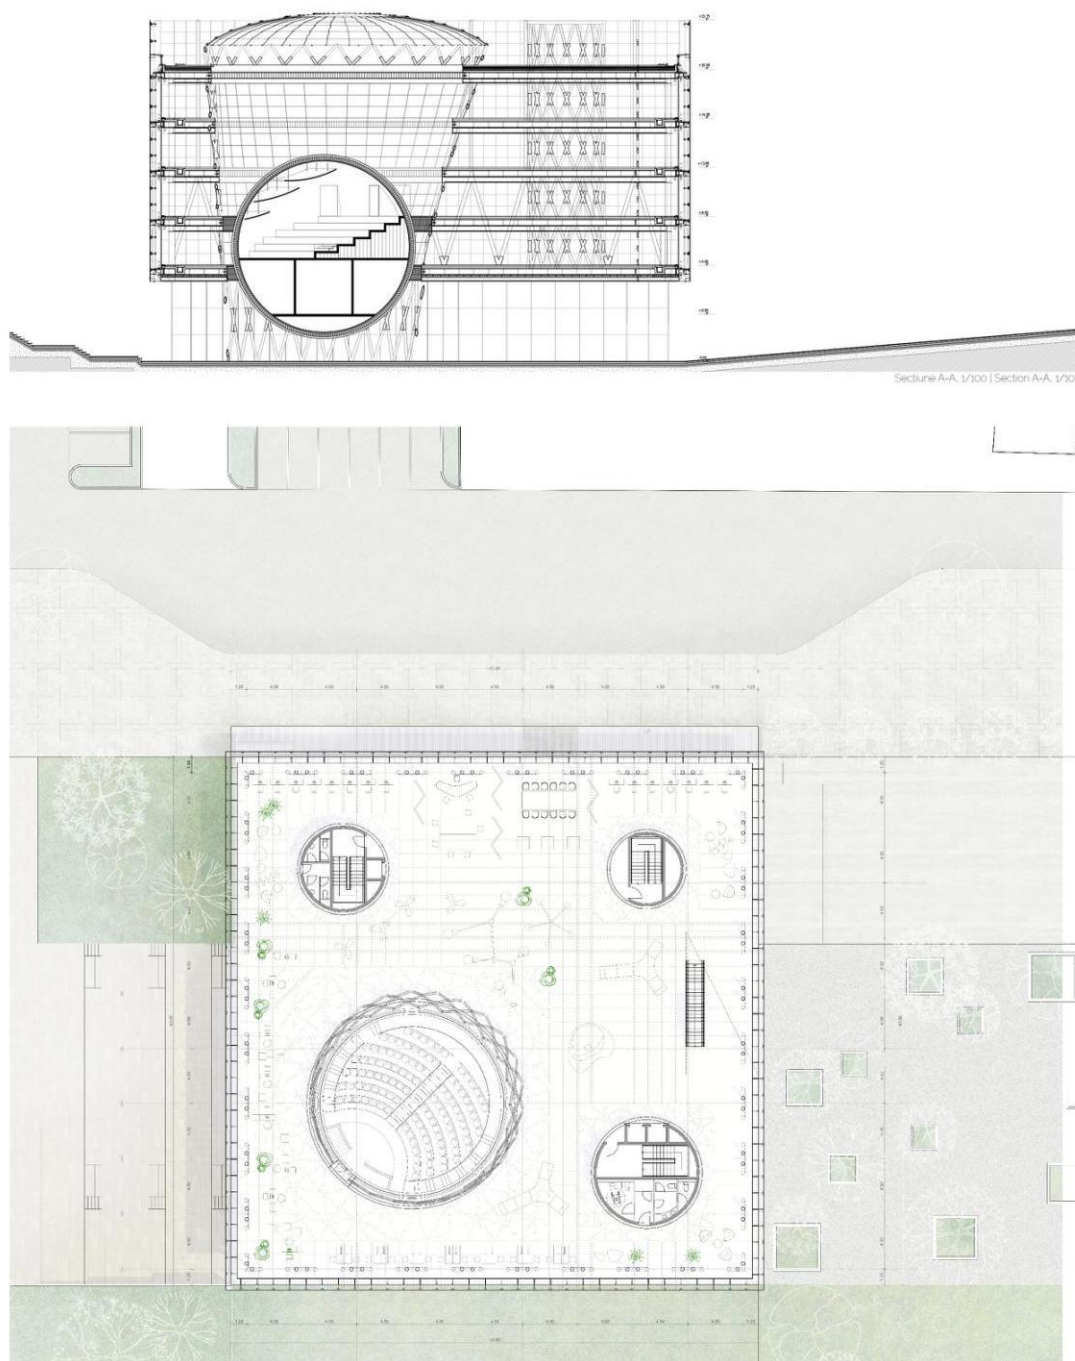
Biotech CUBE. Plan and cross section © Iulia Muraru. Diploma project
